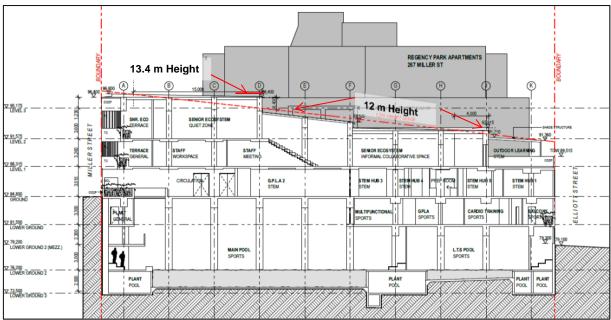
Section Plan showing the proposed maximum height of 13.4 m
